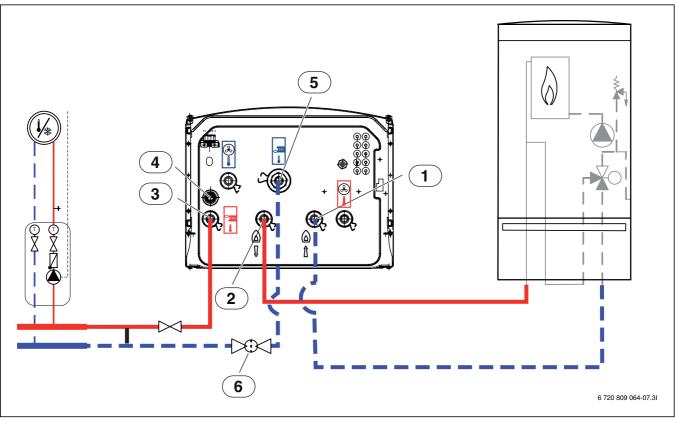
Connection of the heat pump module with mixing valve for external booster heater to the heating system and booster heater
